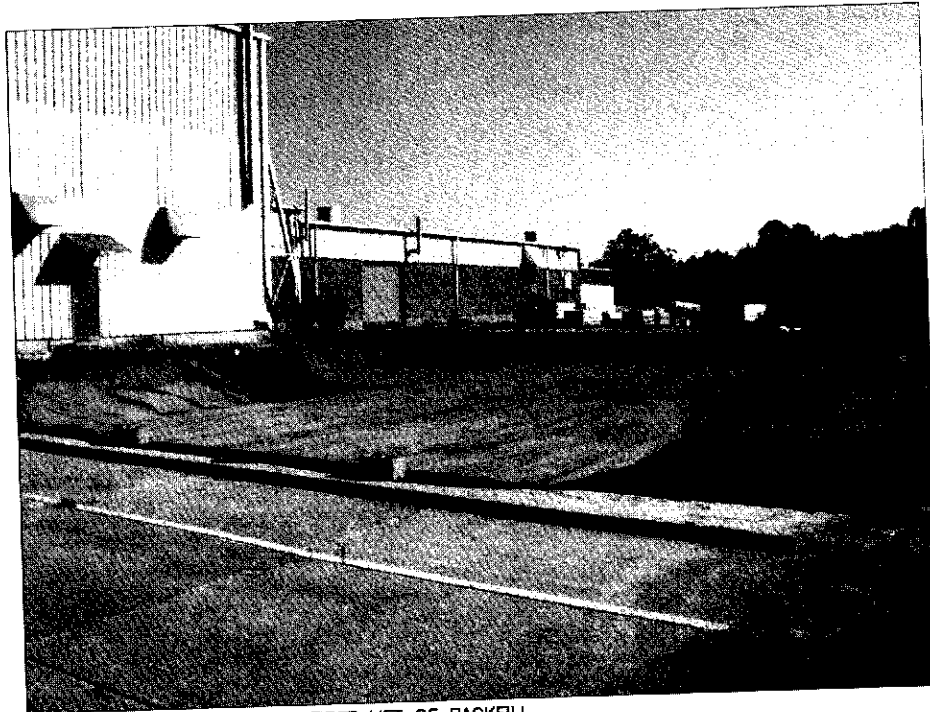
COMPLETED EXCAVATION WITH FIRST LIFT OF BACKFILL
